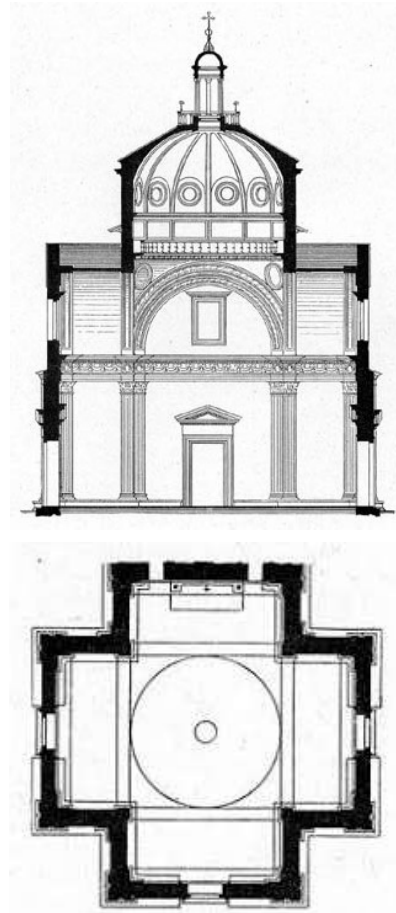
Plan and section of Santa Maria delle Carceri in Prato
